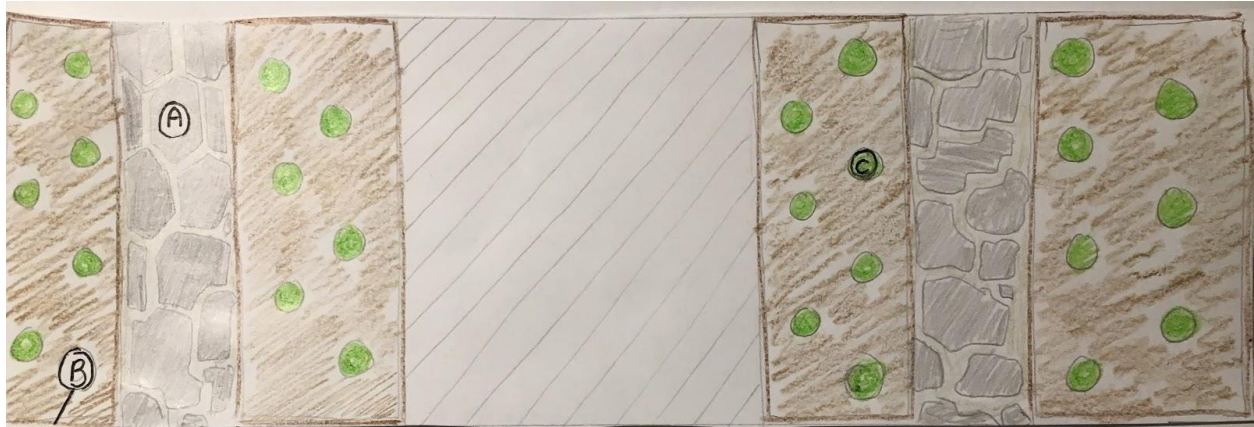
Edible Garden consists of three main elements. The walkways (A) are made out of large pieces of flagstone with and fine gravel or semi-permeable concrete used to fill the cracks. (B) shows a short and thin barrier, likely made out of wood, which will be used to contain the dirt in the garden. The plants (C) in the garden will be native plants that are edible.
